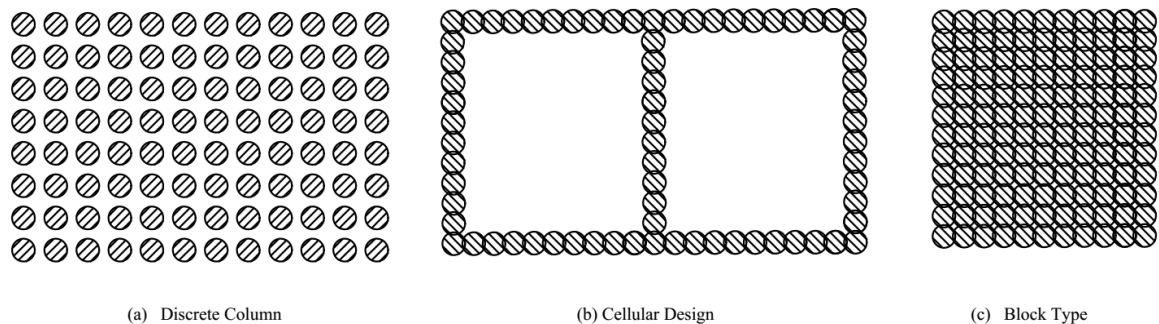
Different methods of jet grout application (a): Discrete columns, (b): Cellular (Lattice) Columns, (c): Block Type of Columns.
